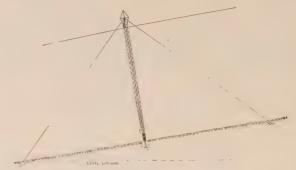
Side Elevation, Post Type Tower on Longitudinal Side-Hill Slope
